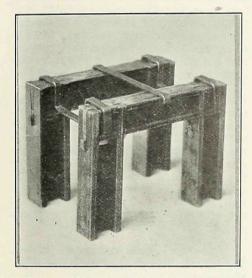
INTERLOCKING STEEL FOR SUBWAYS.
